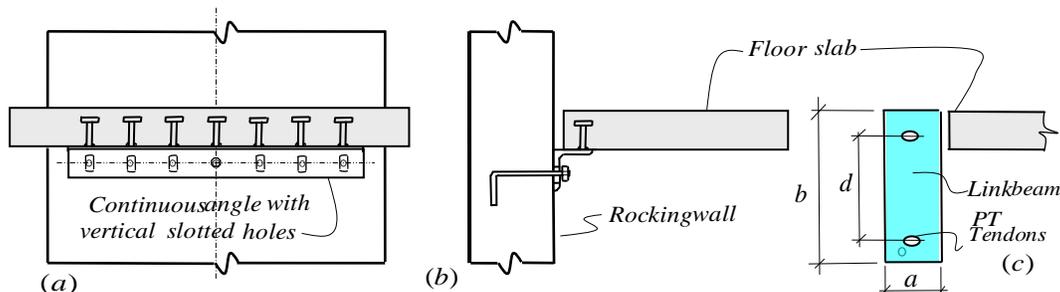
(a) Symbolic wall-slab shear connection, (b) Section showing same, (c) Link beam section
